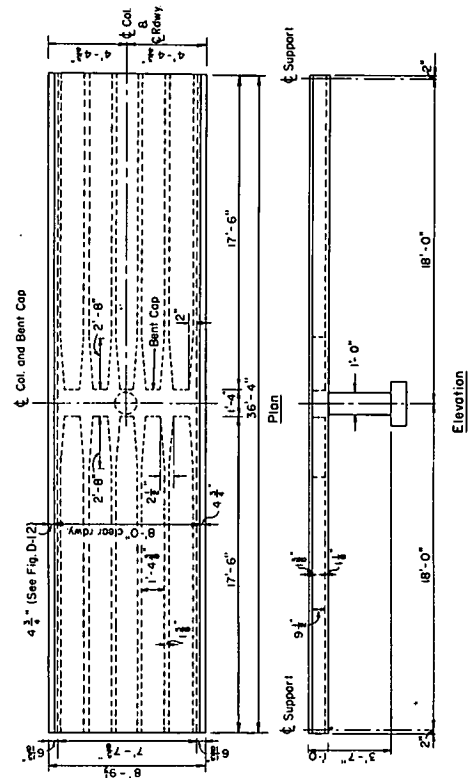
Plan and Elevation of Single-Column Model Bridge
